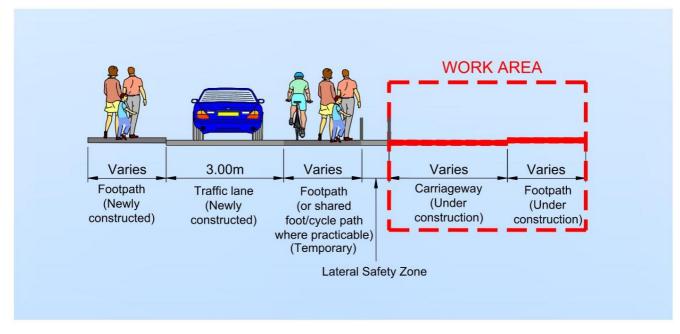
Traffic Management Cross Section, Section 5f – Stage 2
